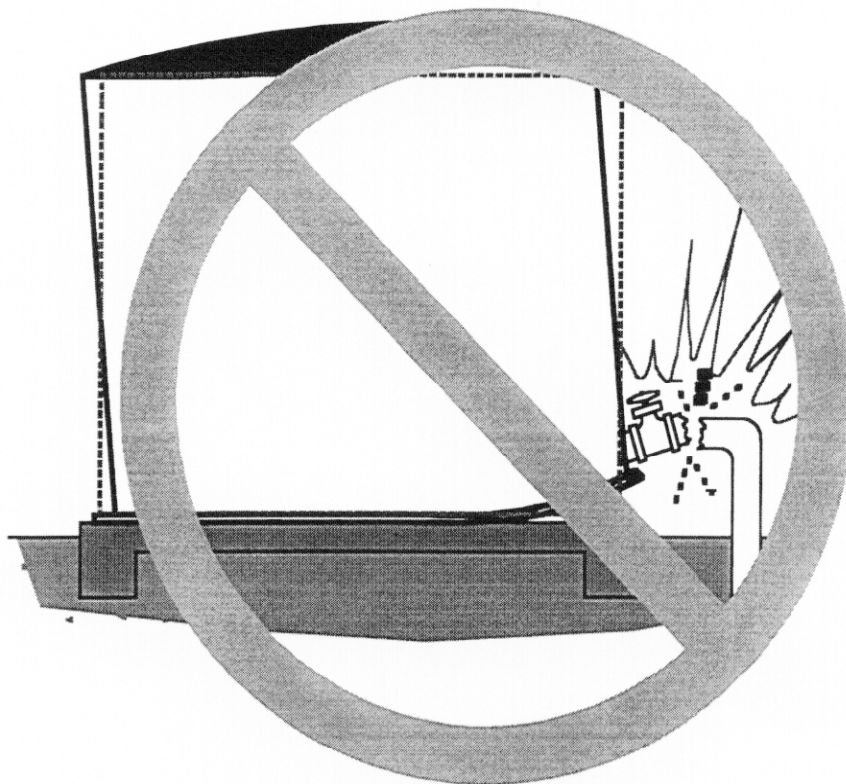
Pipe Break Potential for Unanchored Tanks
